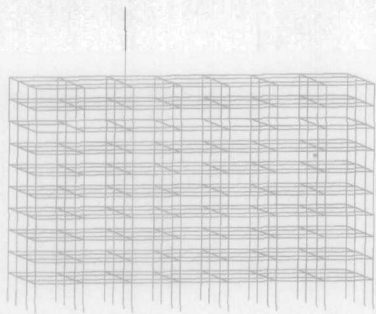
Structural layout of the 10-storey RC frame with a steel tower atop it
